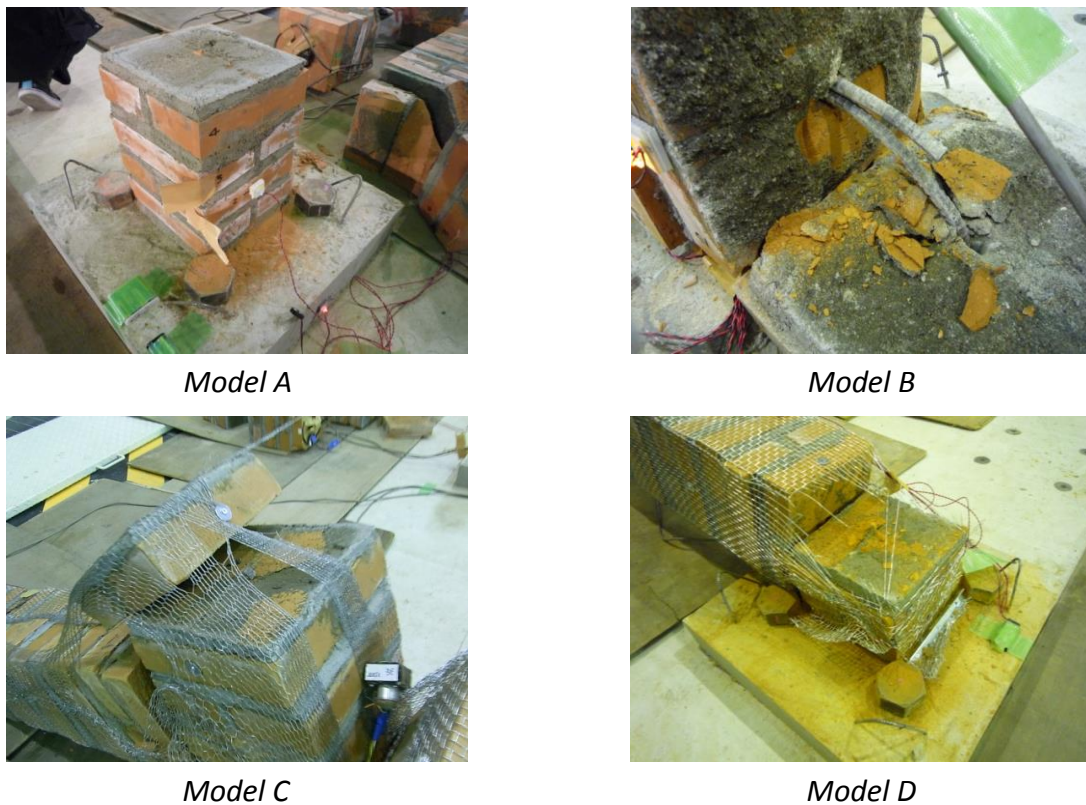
State after the Collapsed of Four Specimens of Brick Masonry Column when Shaking by JMA Kobe 110% (Imai, 2011)
